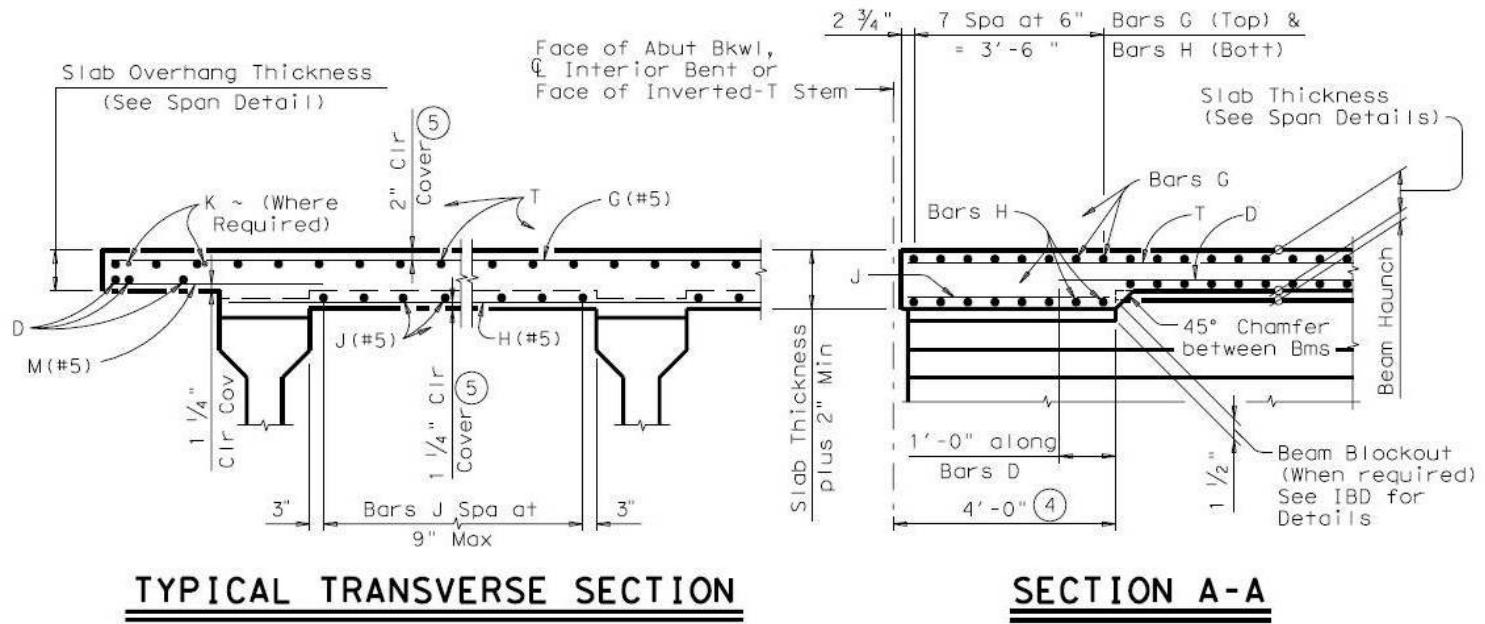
Cross Section Views of IBTS Detail (TxDOT)
